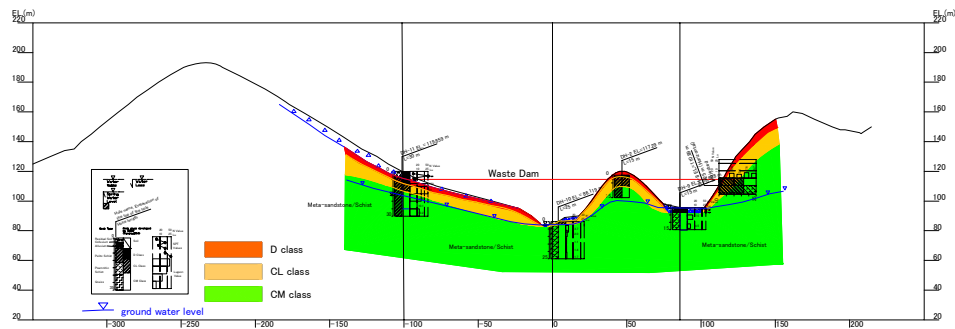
Rock Condition of Waste Storage Dam Axis (View from Downstream side)
